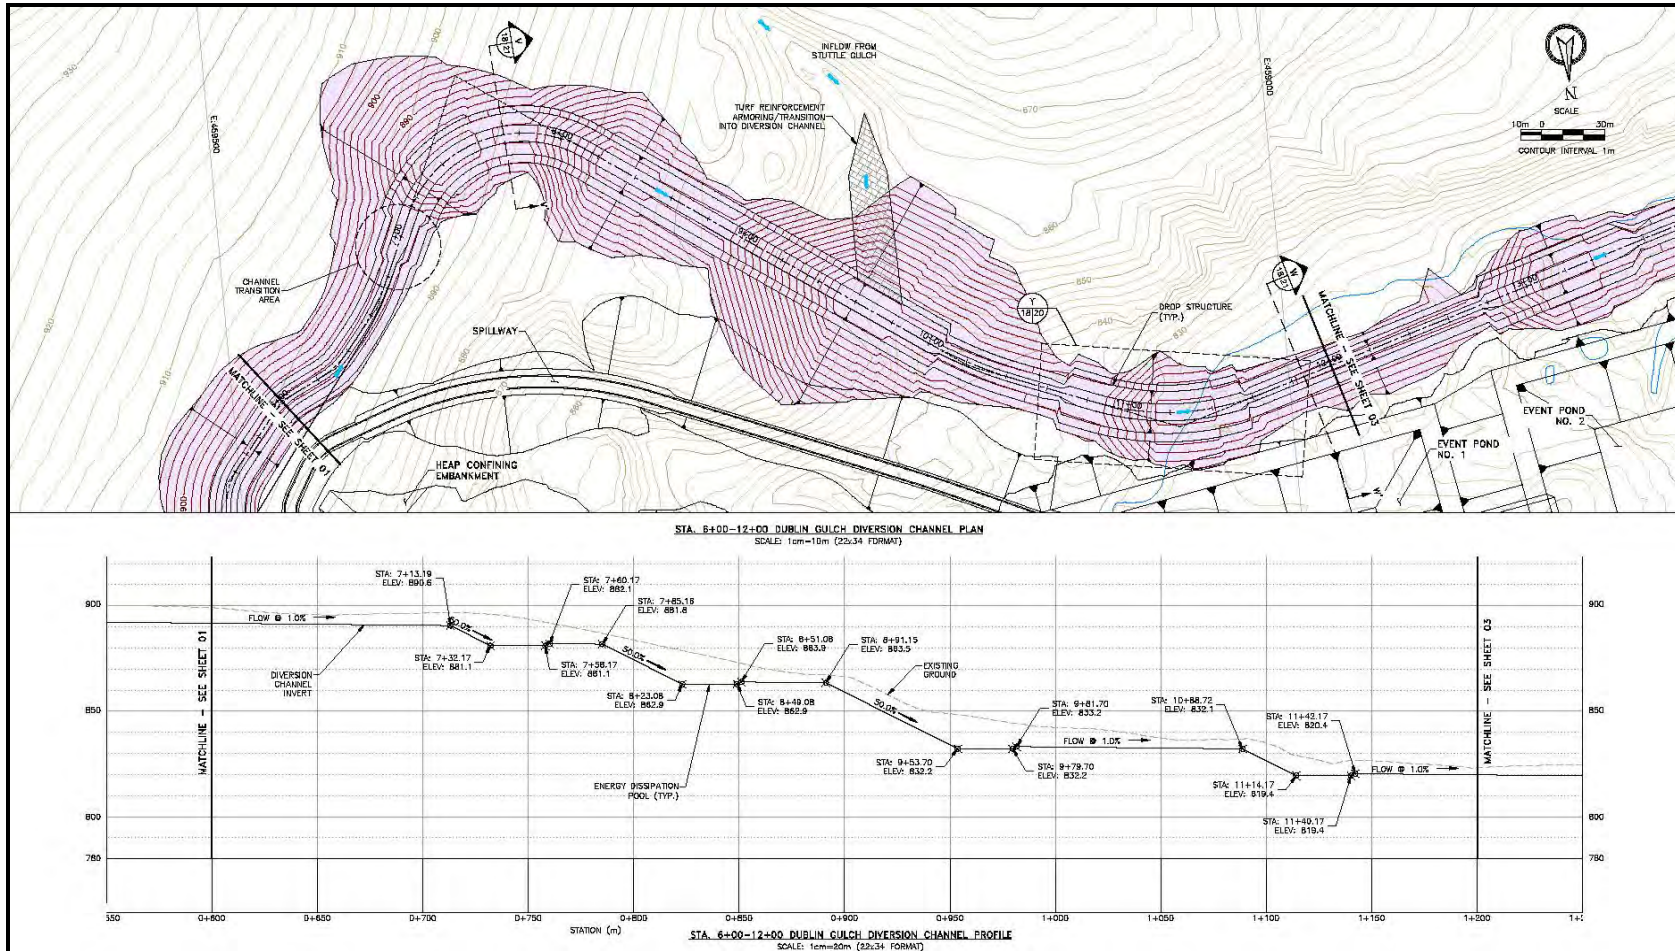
Heap Leach Facility Diversion Plan (2 of 2)
